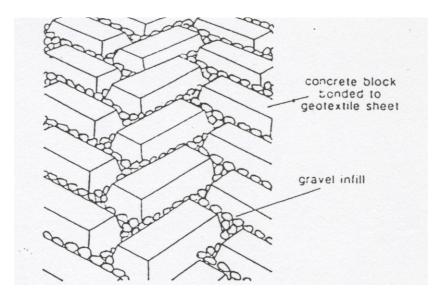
Prefabricated sheet of concrete blocks bonded to a geotextile 2.14.4 Gabion Mattress Protection
